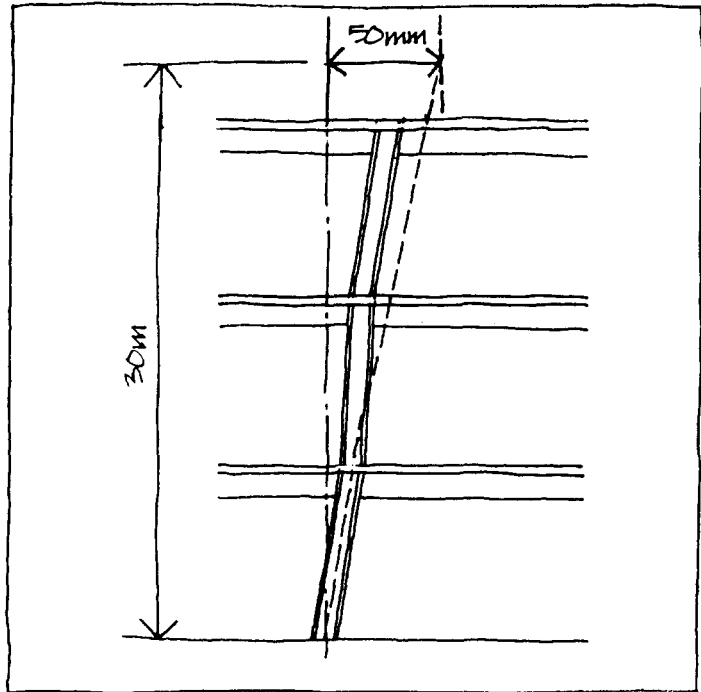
Beam and column alignment at adjacent floor levels (NSSS Clause 9.5.4)
